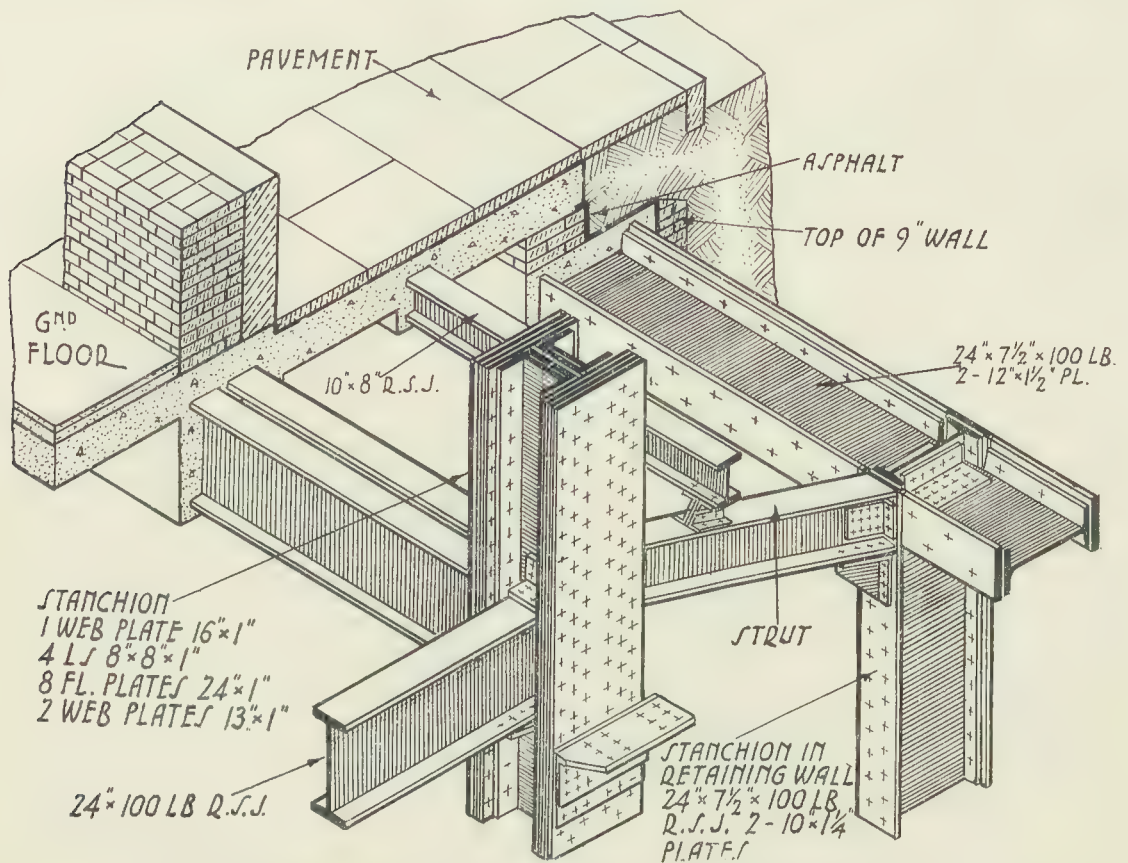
CONSTRUCTION OF RETAINING WALL AT PAVEMENT LEVEL
